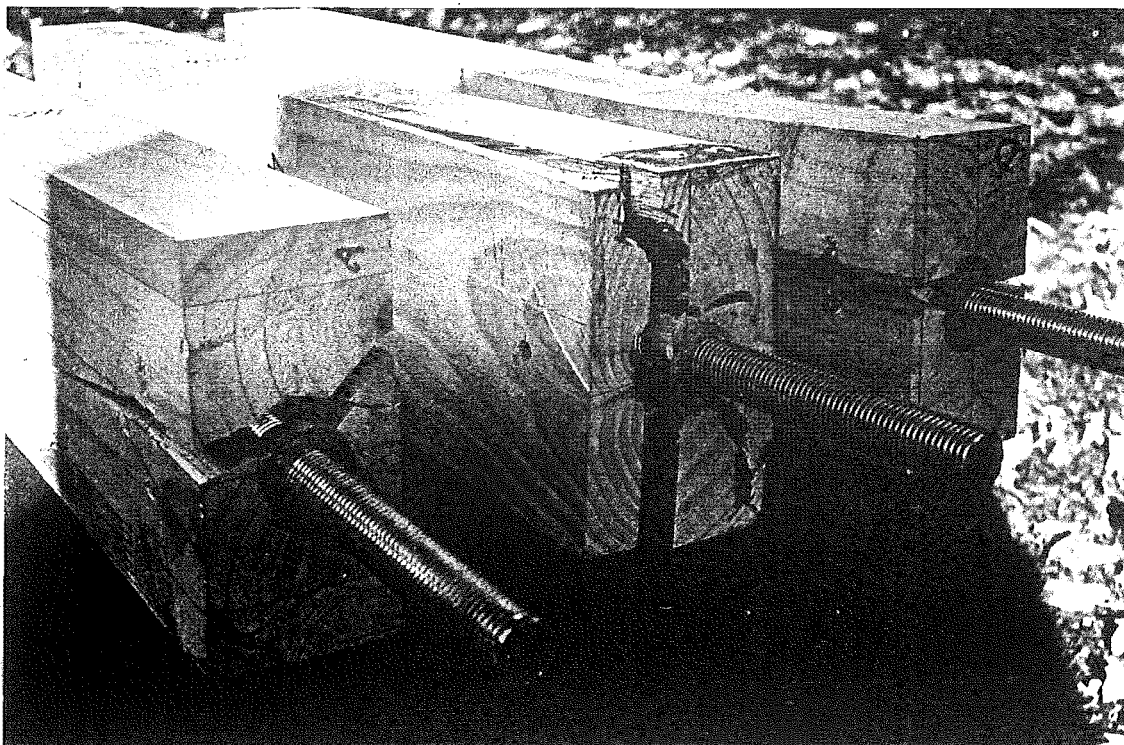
(c) Type 2 failure mode in a rectangular specimen. The middle specimen has transverse reinforcement to prevent splitting in the short direction.
